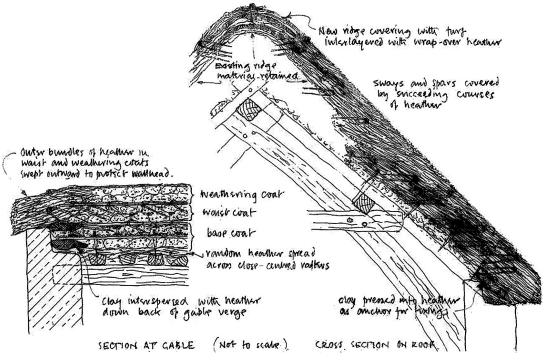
Detailed section of gable verge, ridge and eaves with schematic layering of heather, clay, turf and fixings.
